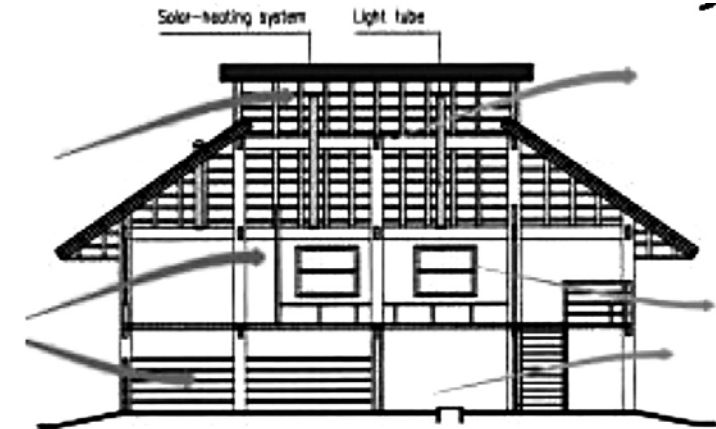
Cross section of the Dai Village House. The ridge of the roof has an integrated solar hot water ridge system. Daylight tubes in the roof are used to transport daylight from the outside into the living room.
